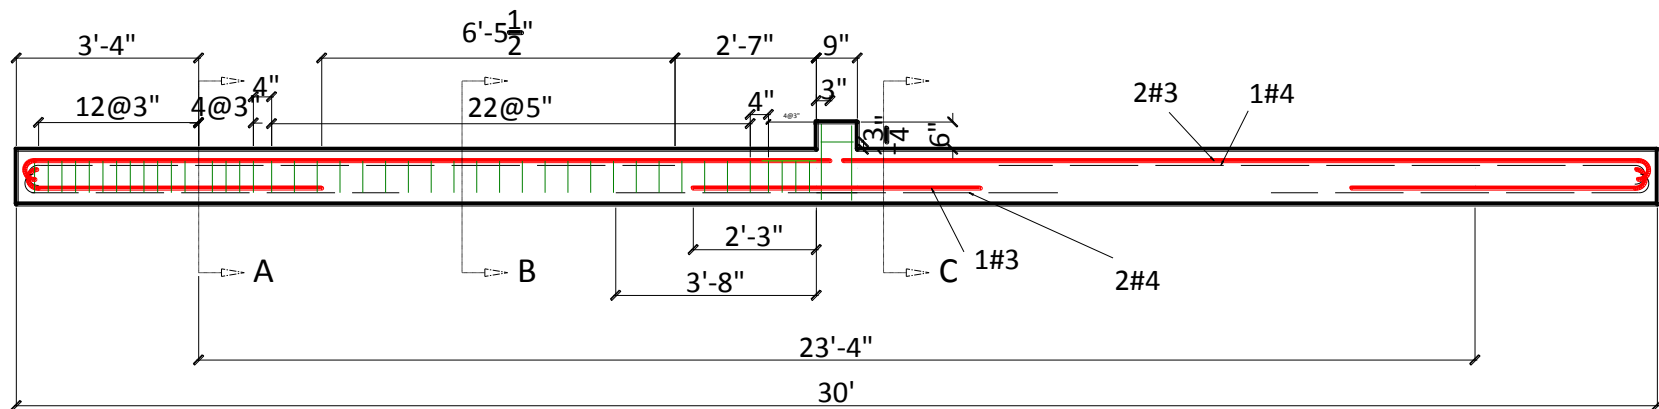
Reinforcement design of test specimen (Orton, 2007)
